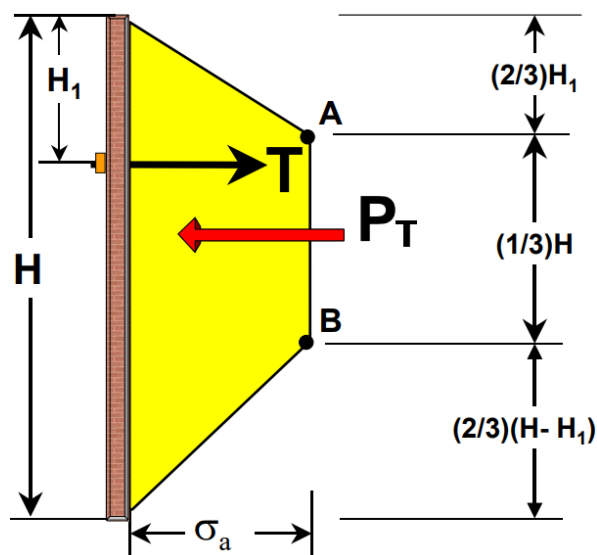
Pressure Diagram for Single Anchored/Braced Wall in Cohesionless Soil
